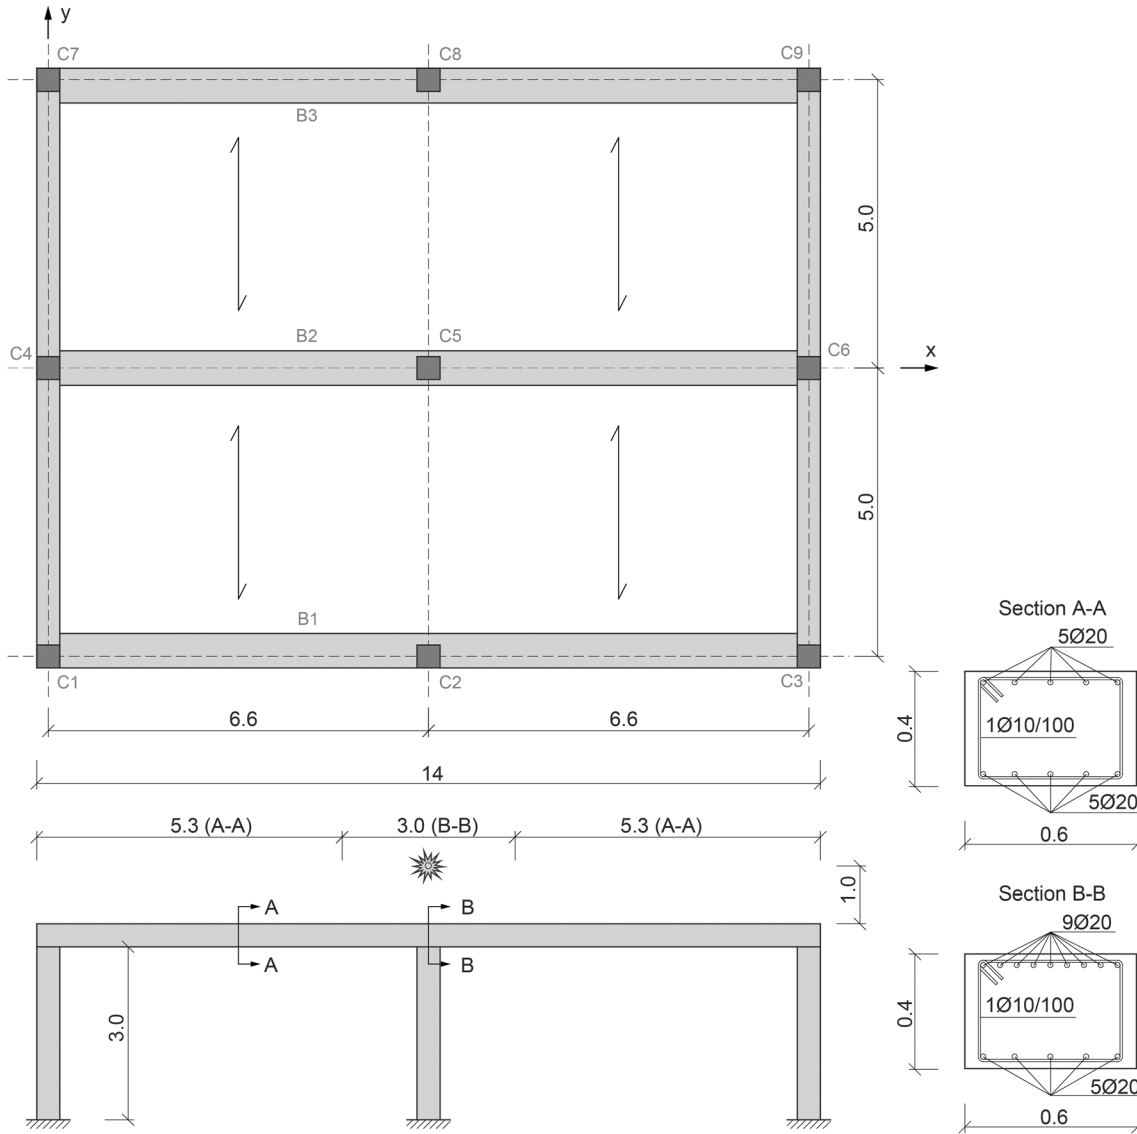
Building geometry: Plan view, front view, and beam cross-sections (measurements in meters).
